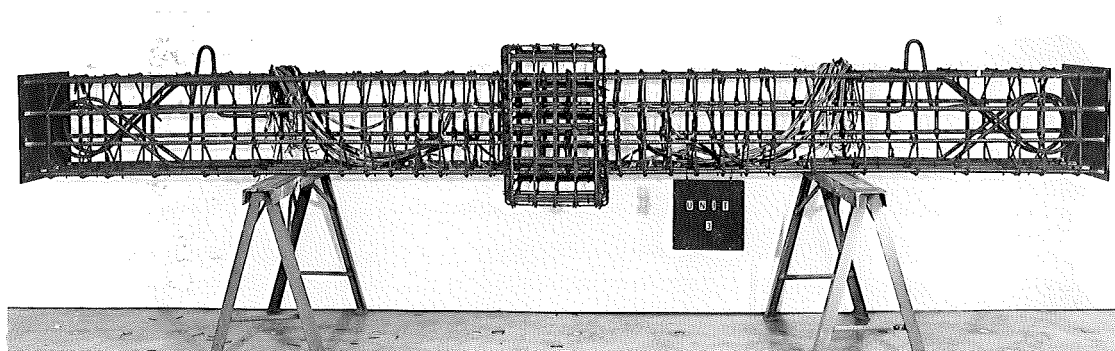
Reinforcing Cage of a Typical Column Unit
